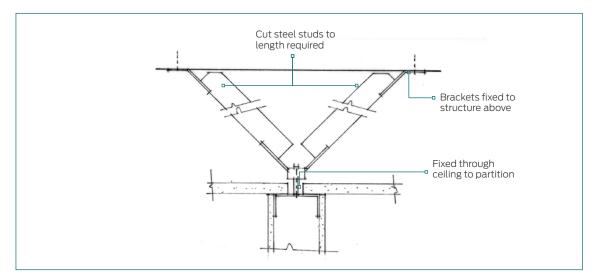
Proprietary internal wall bracing connection (isolated from ceiling movement).
